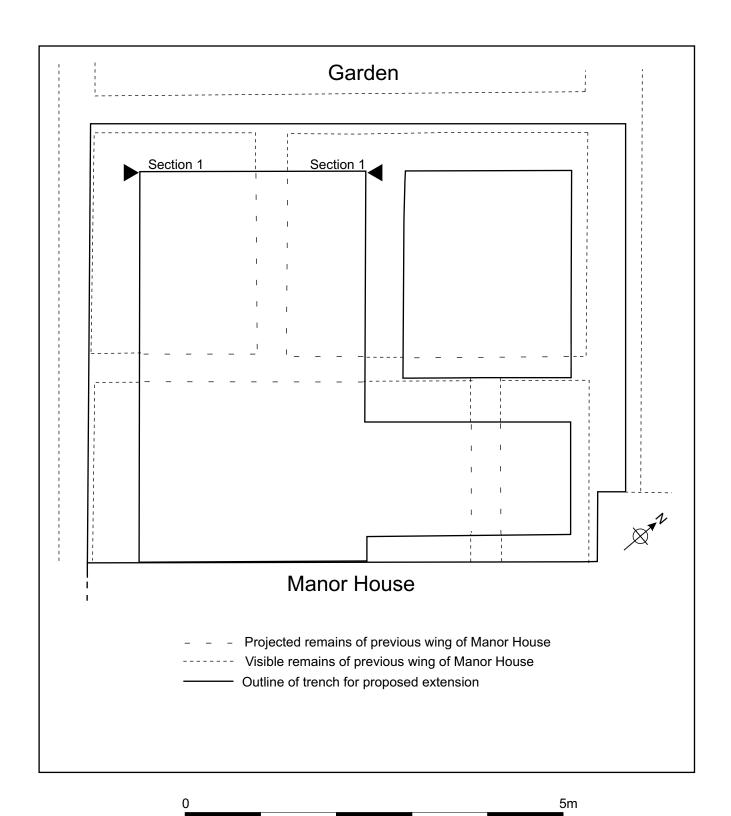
Plan of the new footing trenches in relation to the remains of a demolished wing of the Manor House
